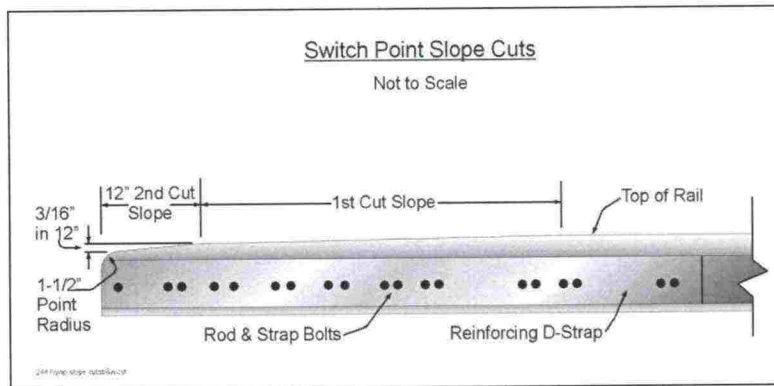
Typical AREMA Detail 5100 Switch Point
